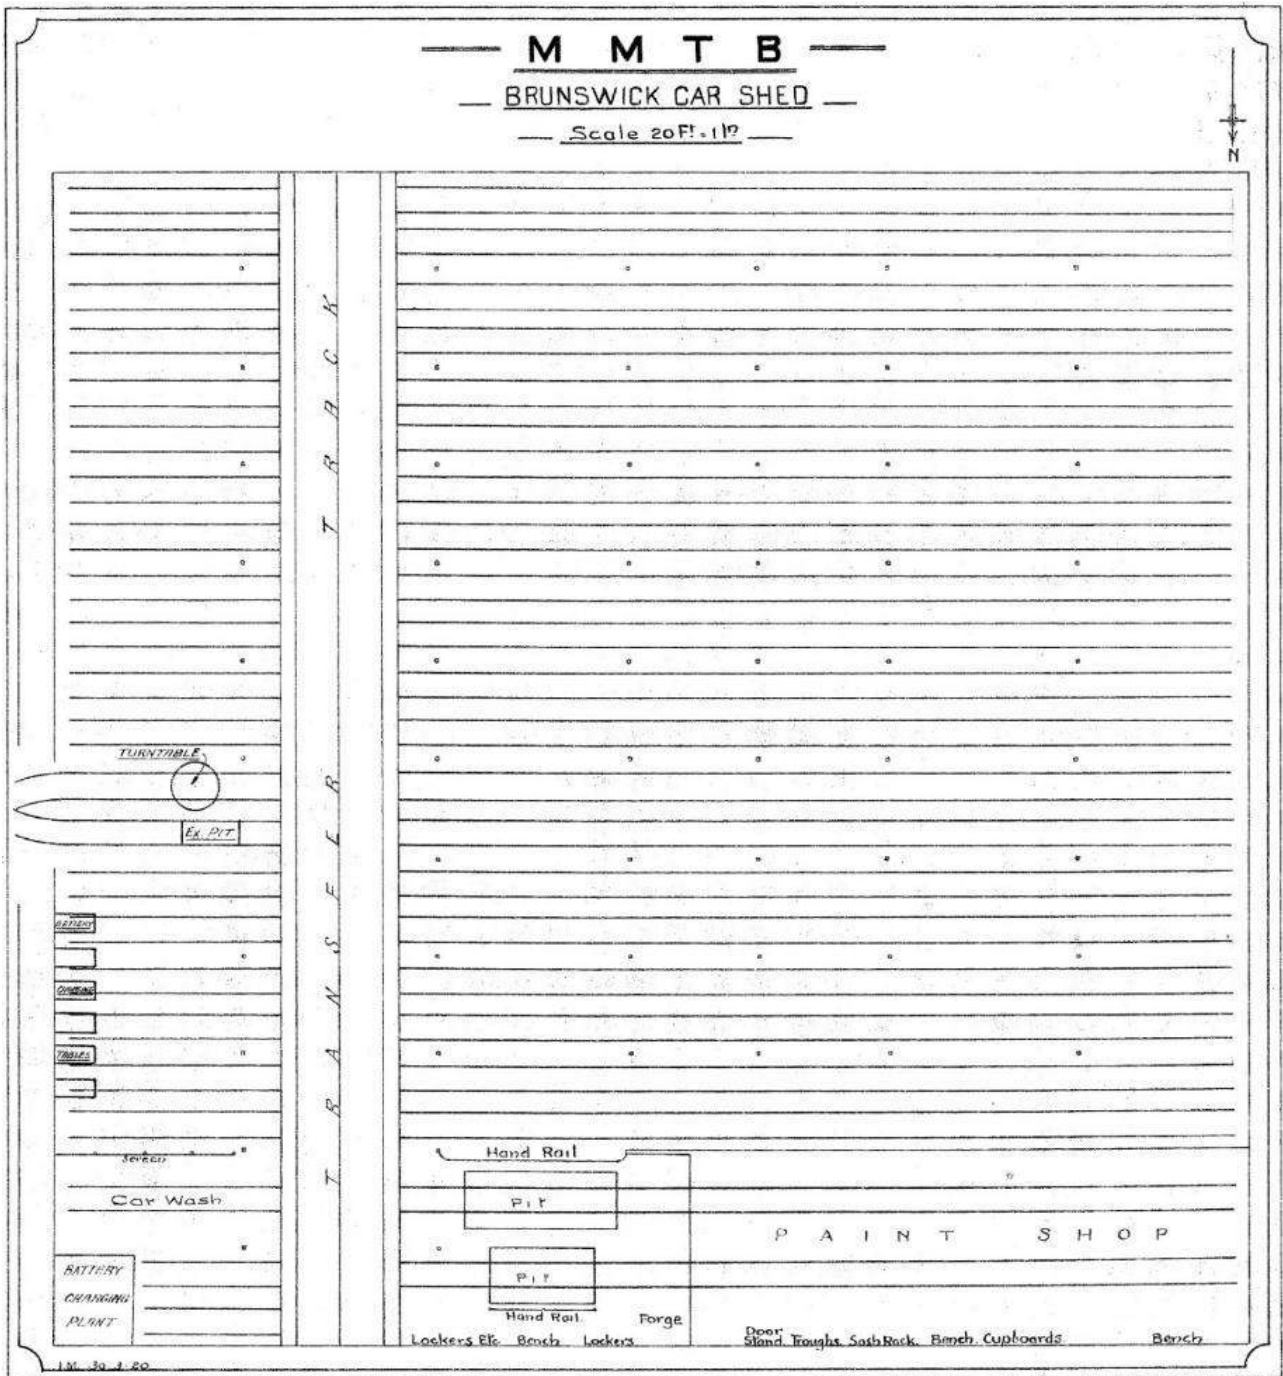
MMTB's 1920 plan of the Brunswick Car Shed (Source: Keith Kings Cable Drawings Collection)
